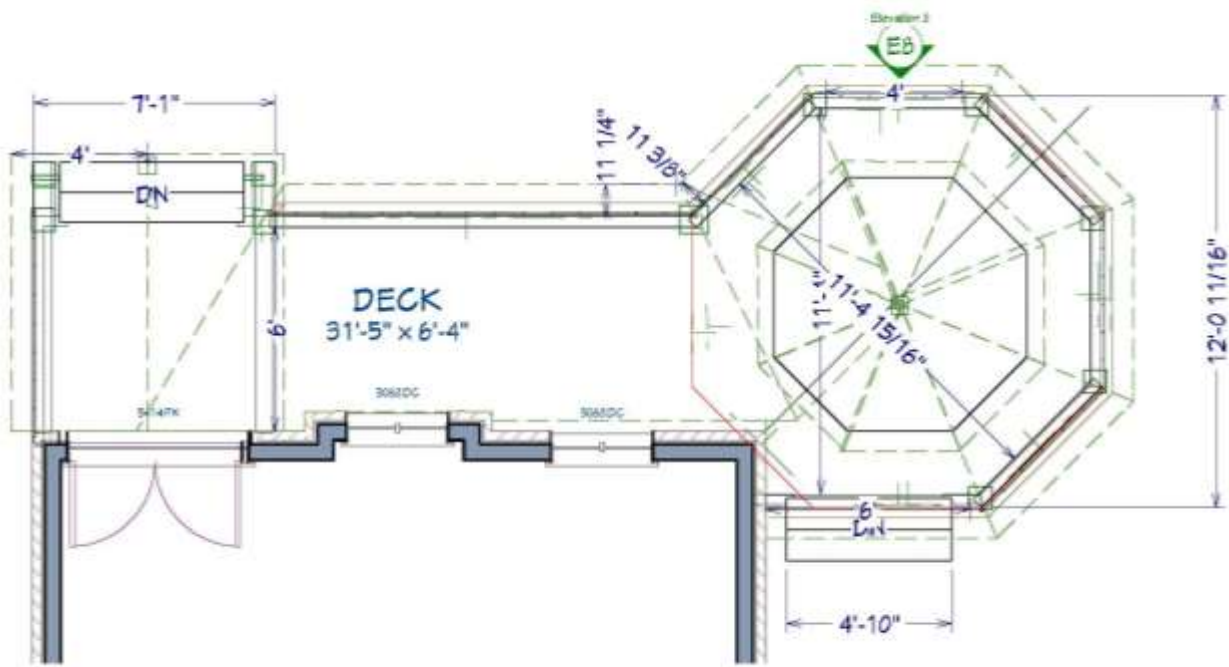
Architectural plan drawing of new porch at 529 Princess Avenue
